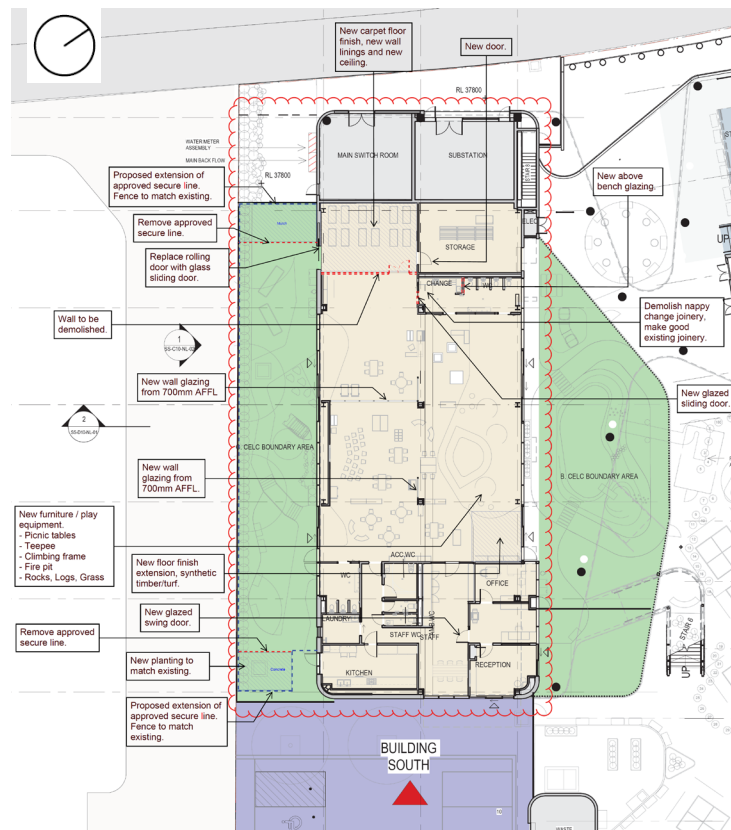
Extract of proposed Level 1 floor plan of the CELC (Source: Alleanza Architecture)
